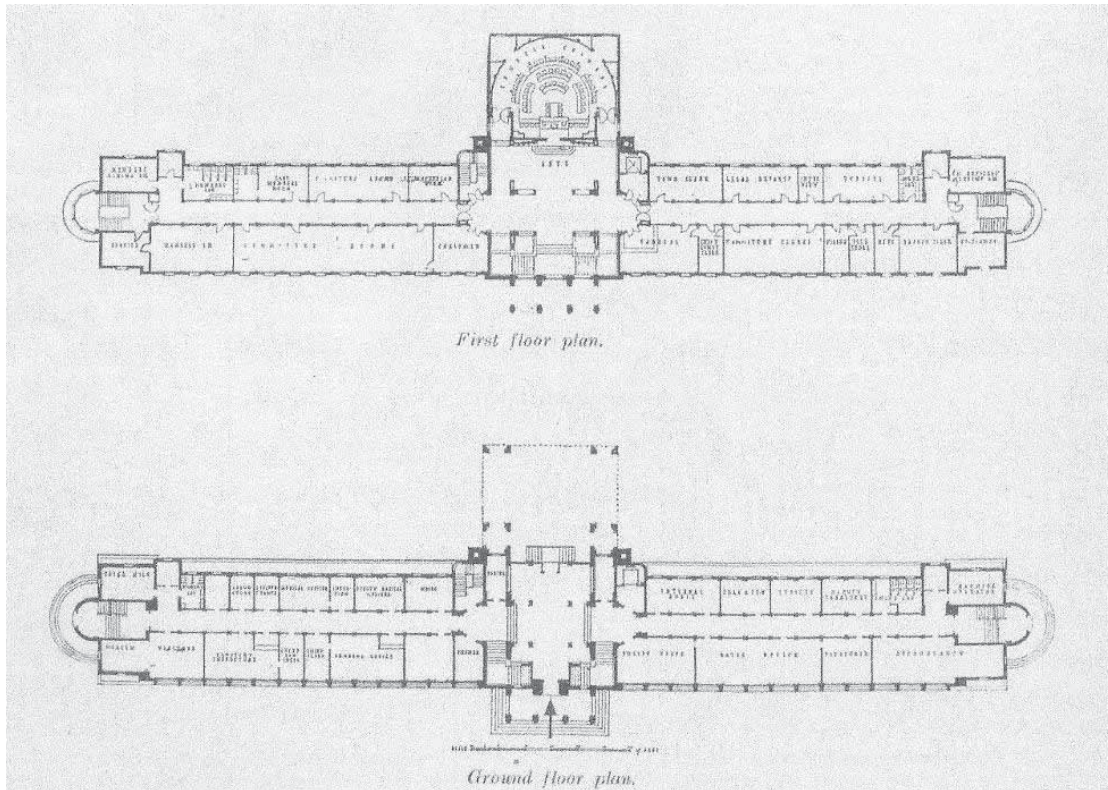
Upper ground floor of the Swansea Guildhall
